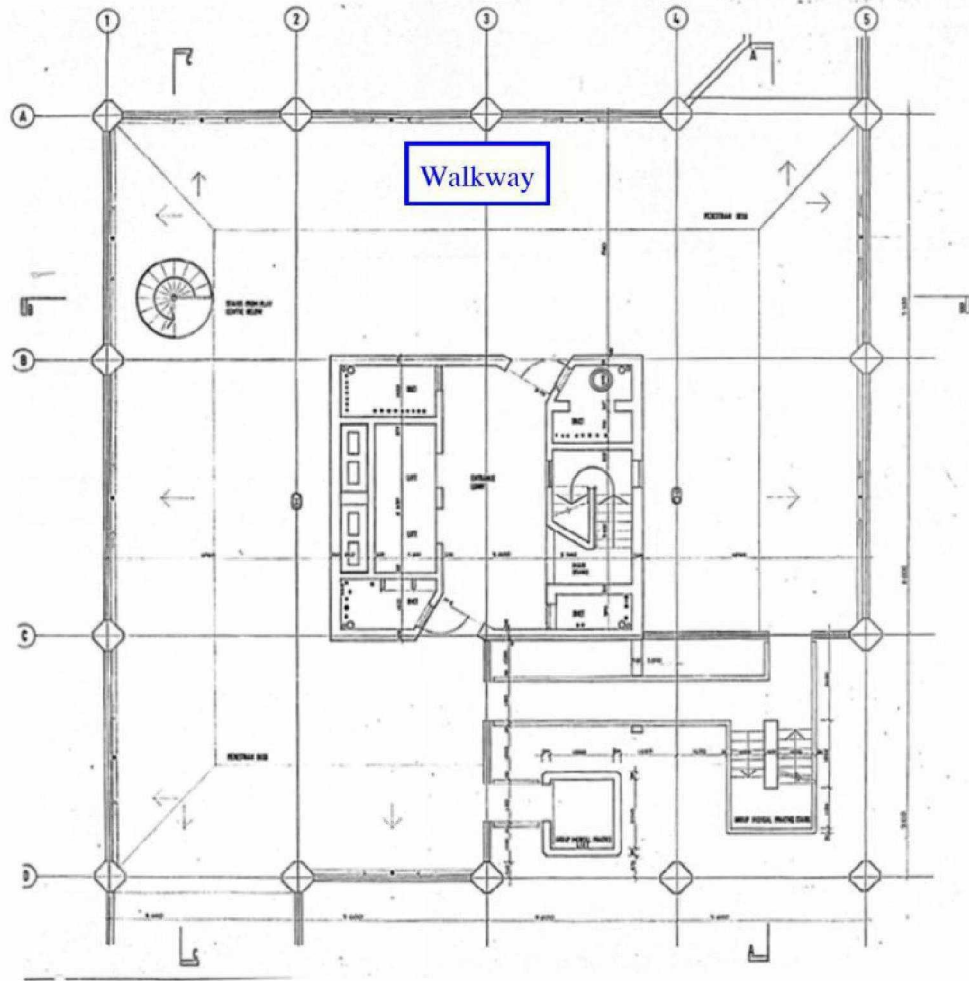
Original level 2 floor plan. (RBK00018833)
